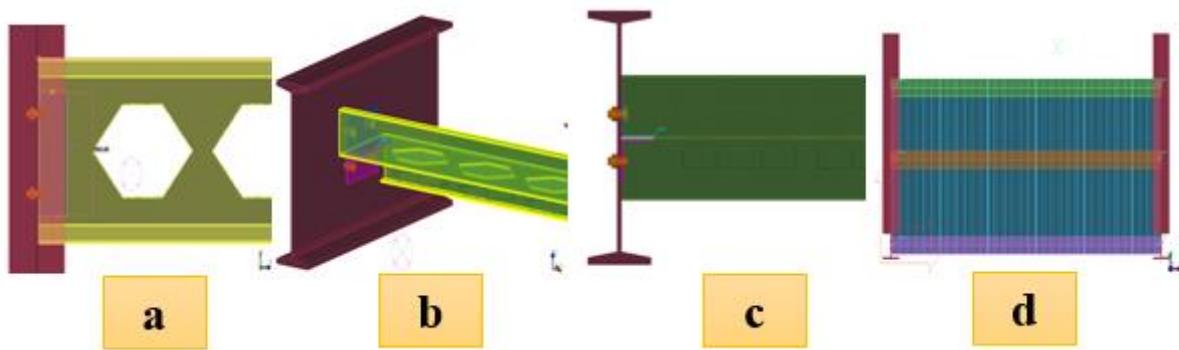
(a) Secondary beam column connection detailing in three dimensional view 1 to 3 was marked as a,b,c; (d) decking profile model + Secondary beam connection details
